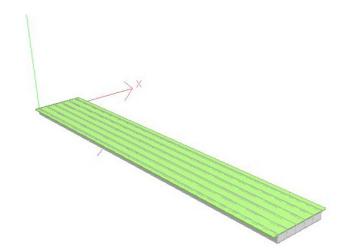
Fig. J Composite Multi-Cell Box-Girder Bridge [5c-80] (Top View)
